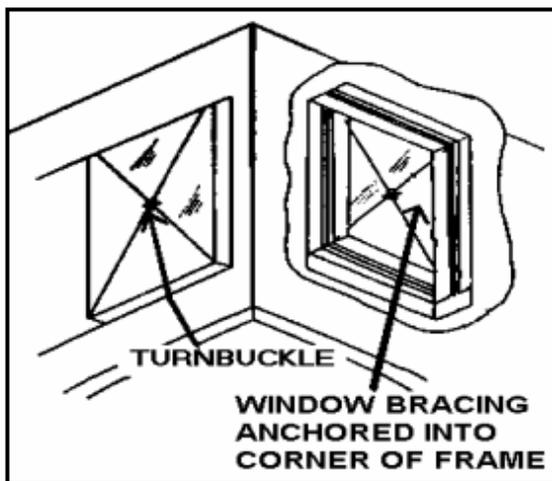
Window Anchoring (left) and Window Frame Reinforcement (right)
